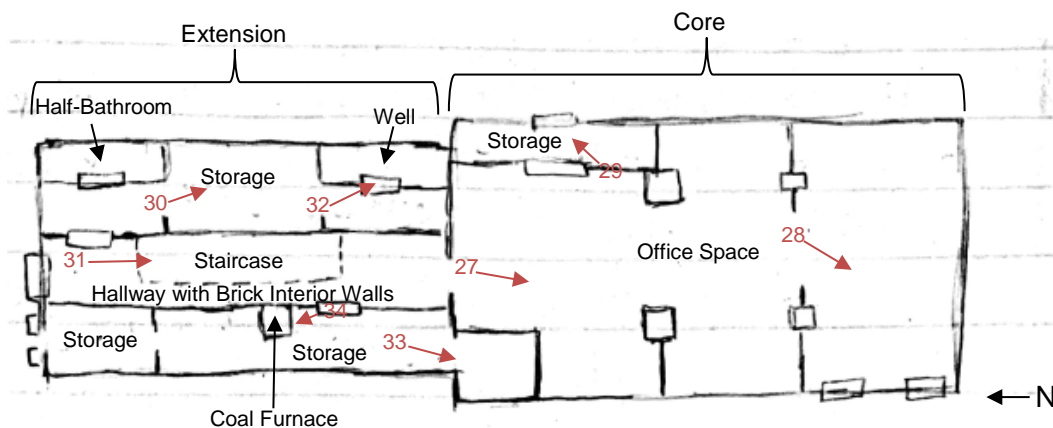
Floor Plan Sketch and Interior Photograph Key of the Basement. Sketch not to scale.
